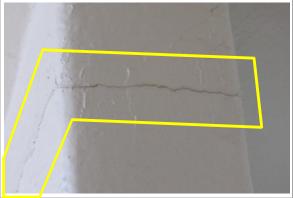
Crack at the top section of the wall Photo 8: Closer view of the crack (refer to Photo 9)
